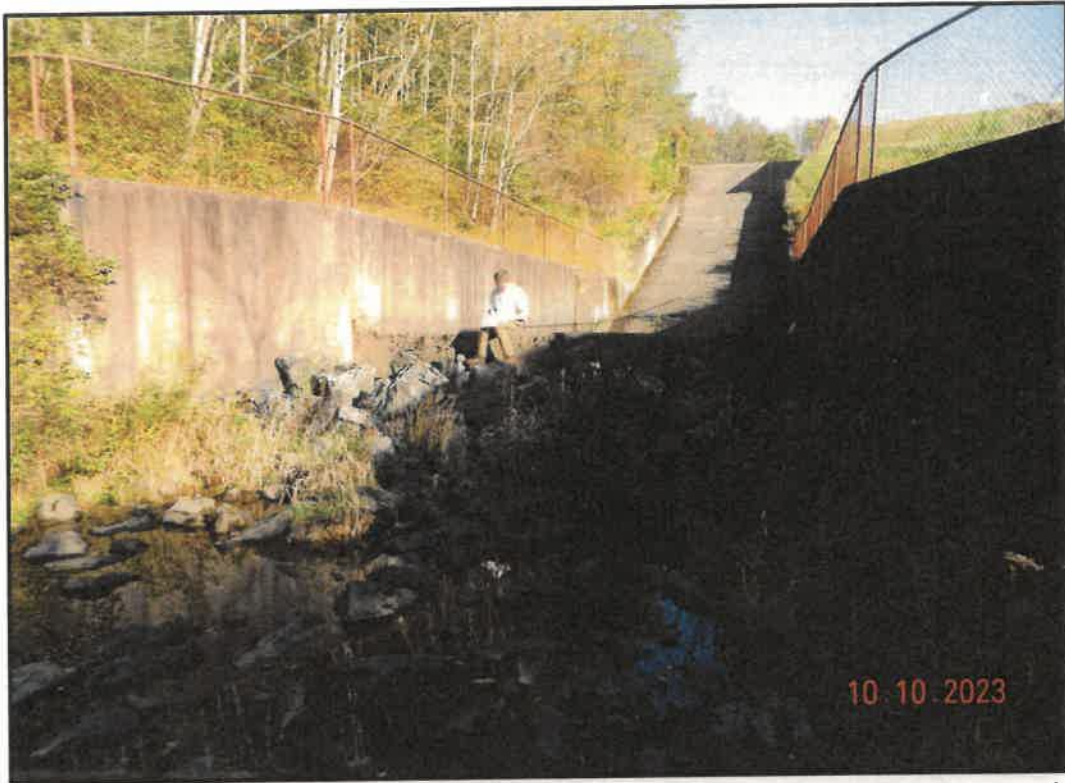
View of Stilling Basin Wall and Weir. Note corroded ends of pipes passing through stilling basin wall
